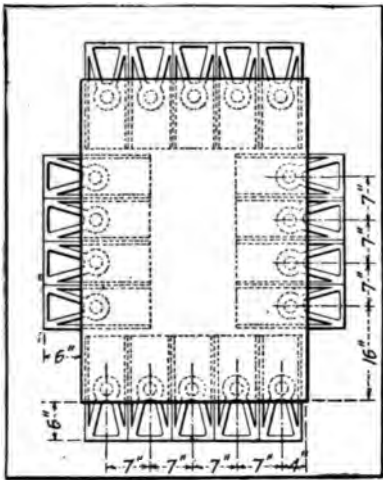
Column Footing, Twelve-Story Loft Building.
